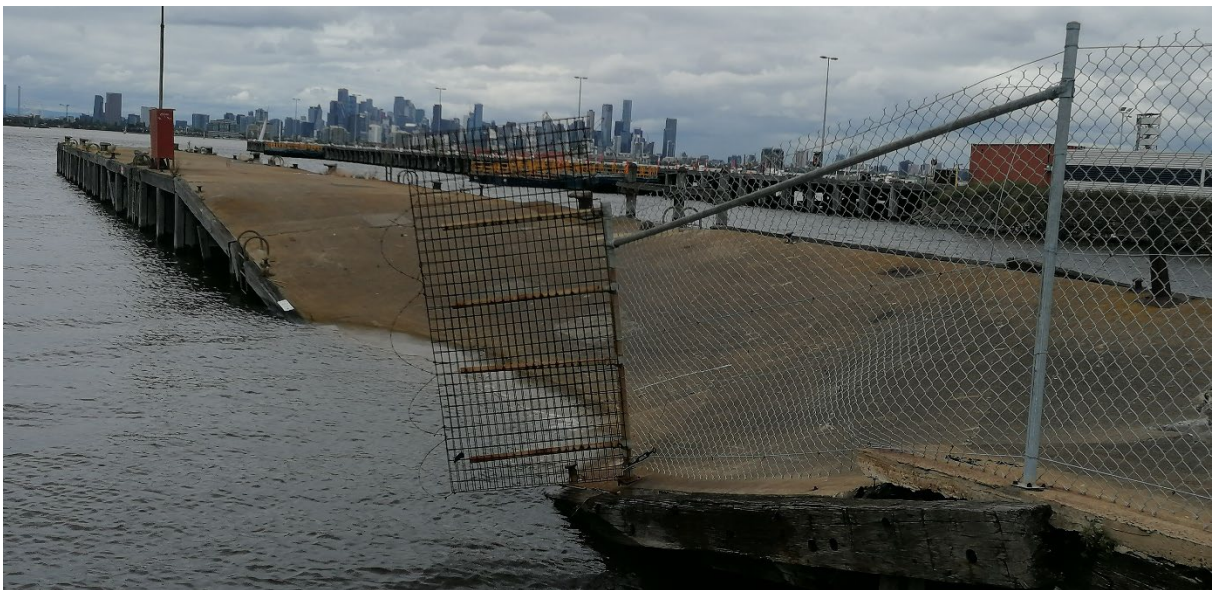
Boyd Street Pier showing a large area which has collapsed into the water.
